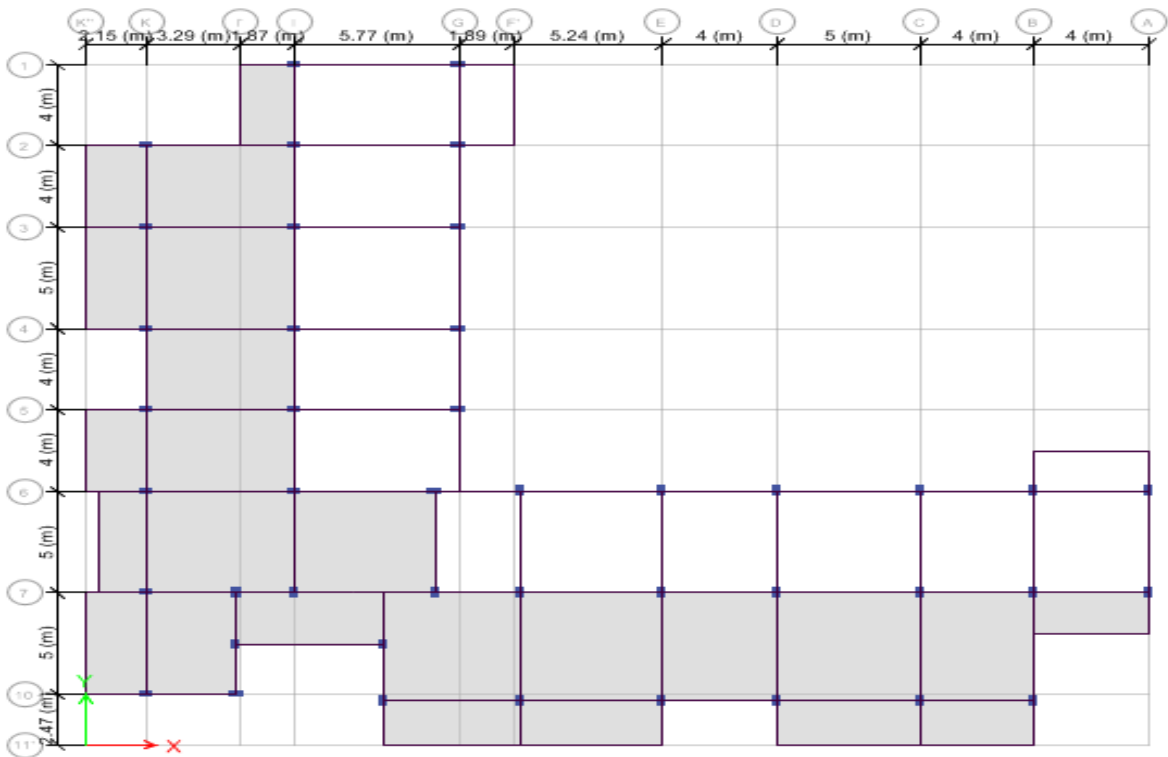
Typical Plan view Eight Storey Nonlinear or RC L-Shaped Building without shear wall
